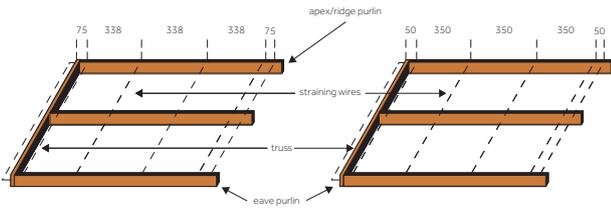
Diagram A – 150mm sidelap joint. Straining wire central to overlapping.
